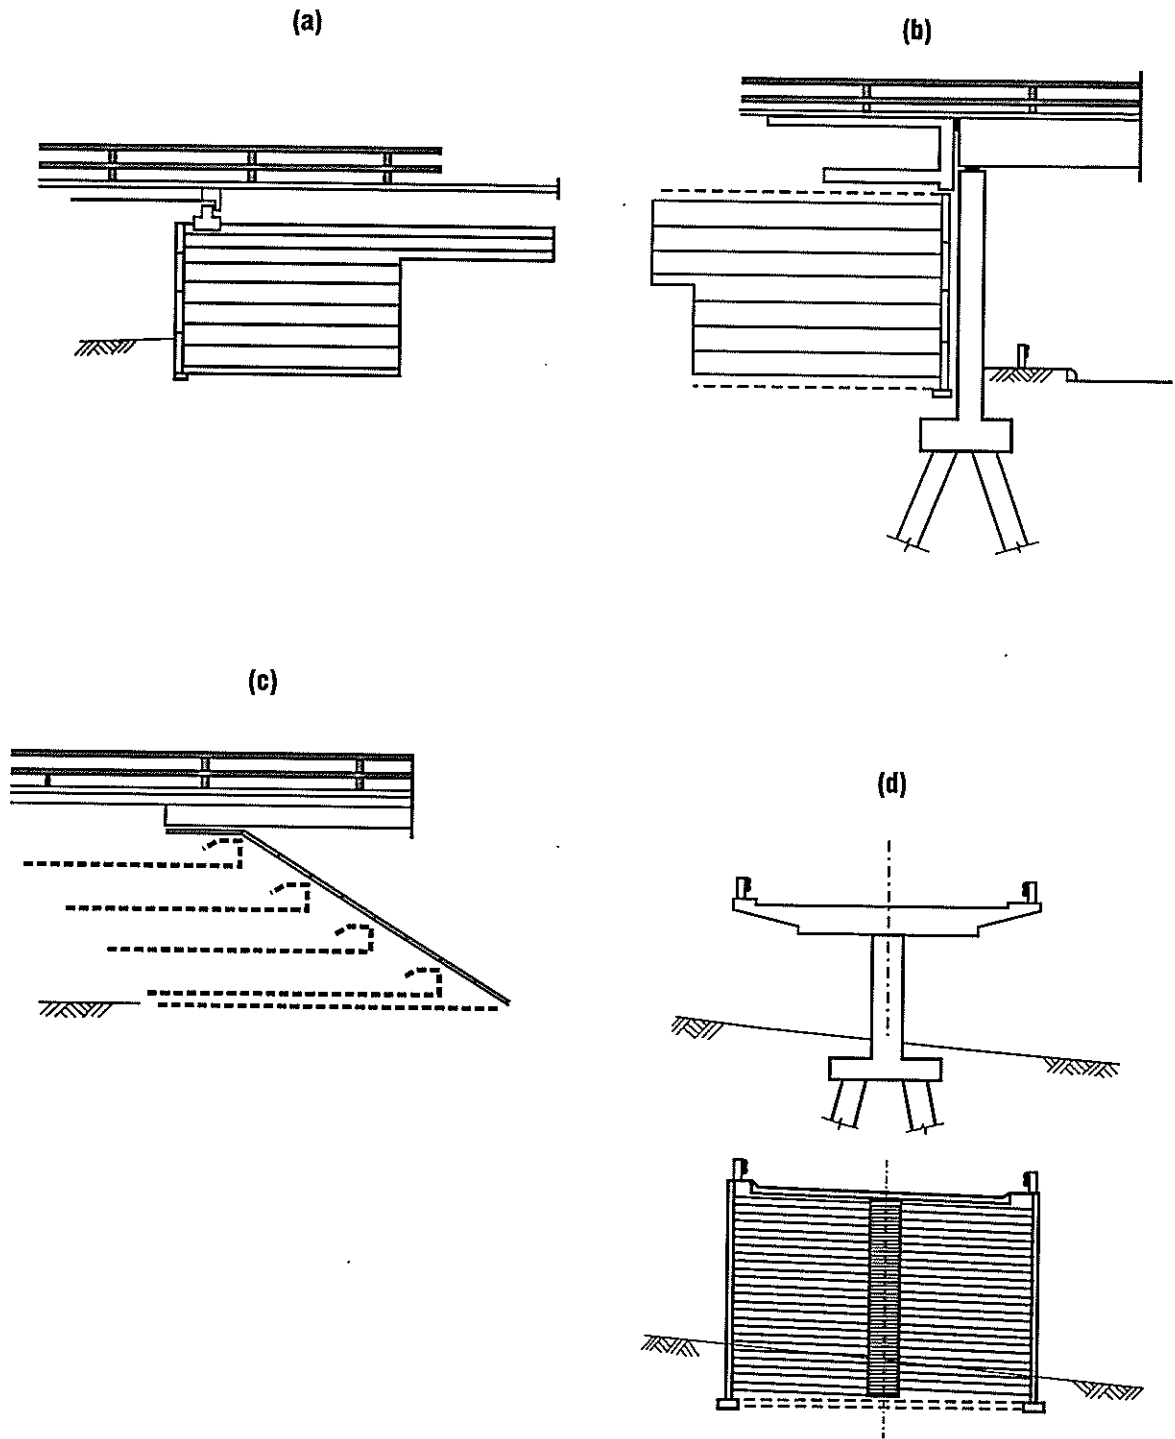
Applications of GRS: (a), (b), (c) Bridge abutments; (d) Reinforced embankment in place of viaduct.
